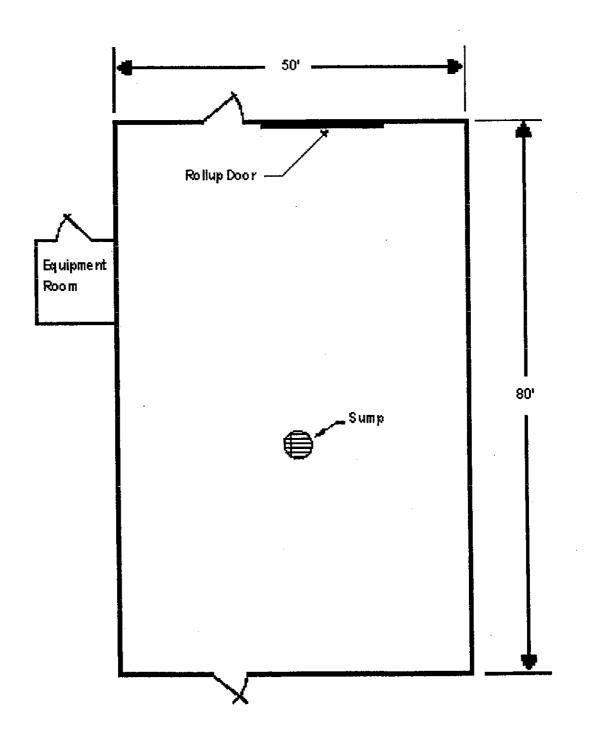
(Proposed) Solid Low-Level Waste Storage Facility, Building 7580.
